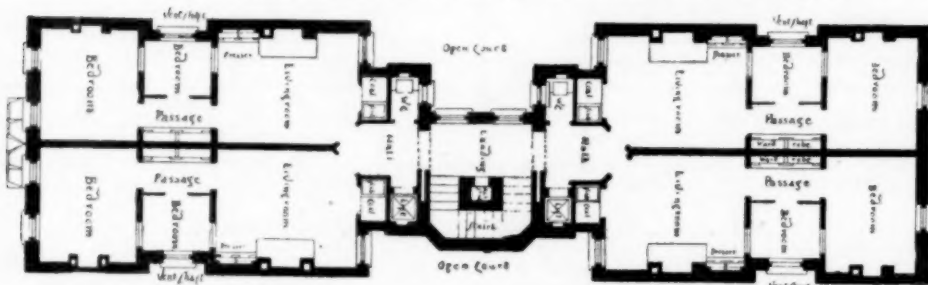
Fourth Prize Tenement-house Plan of 1879. After the *Plumber and Sanitary Engineer*.
